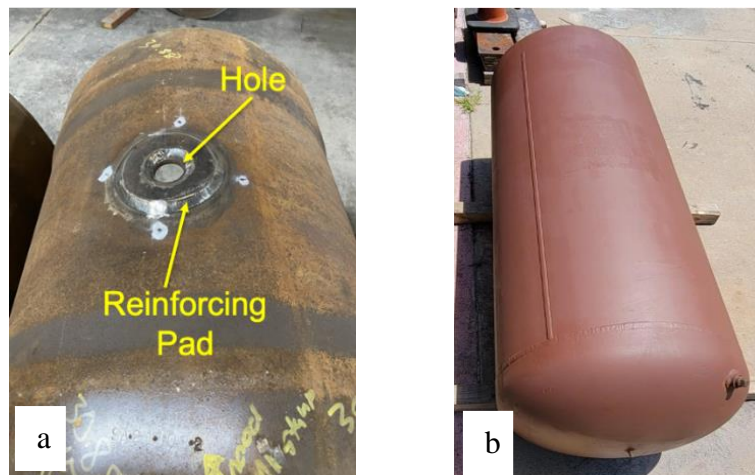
(a) Pipe Sample with Hole Spanning and (b) Spigot Ends with Dish Heads
